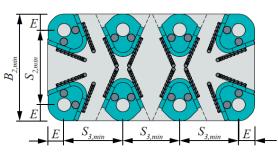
Examples of geometries and minimum spacings of BOLDA® Column Shoes
